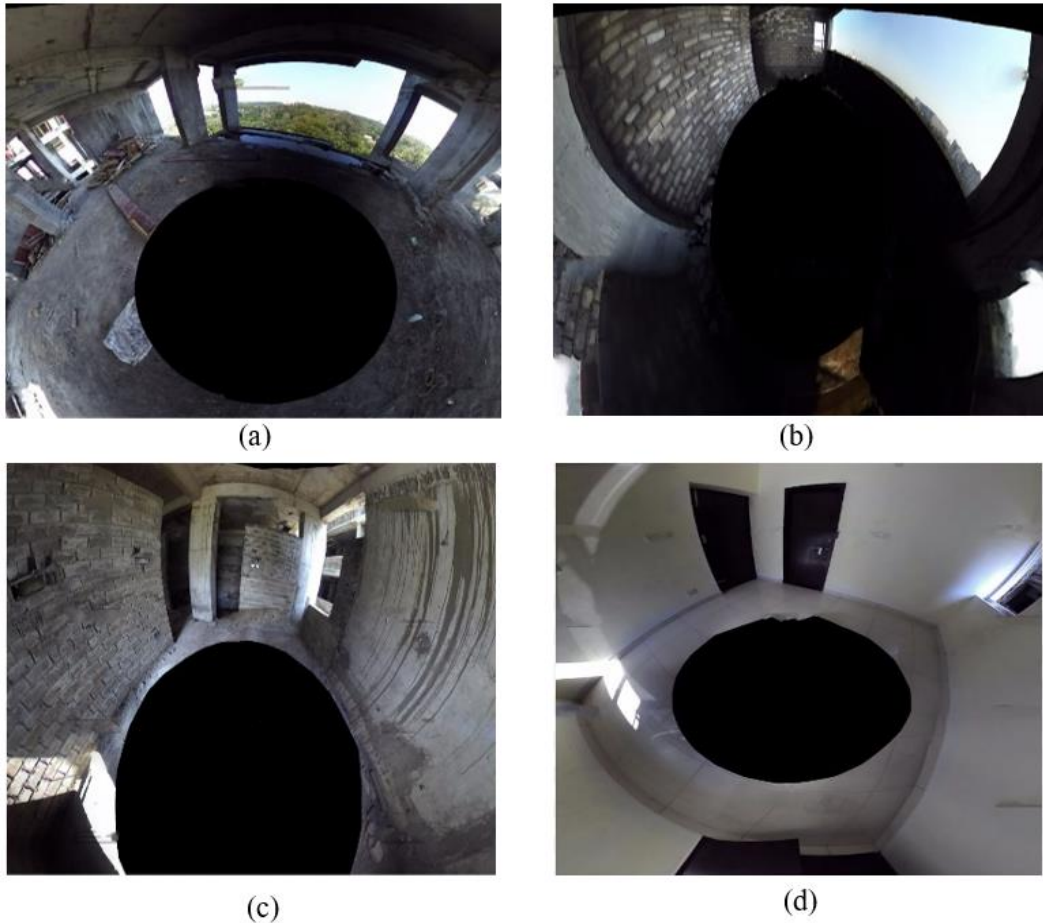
(a) Construction stage 1 (b) Construction stage 2 (c) Construction stage 3 (d) Construction stage 4
